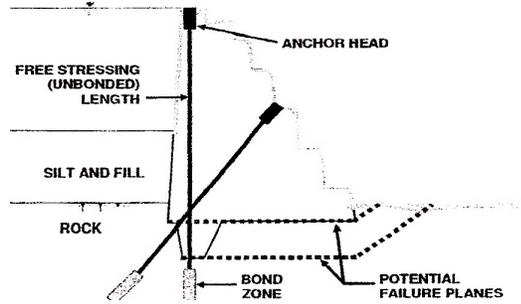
illustrates a typical anchor installation in the Gilboa Dam Spillway (Zicko et al. 2007).
